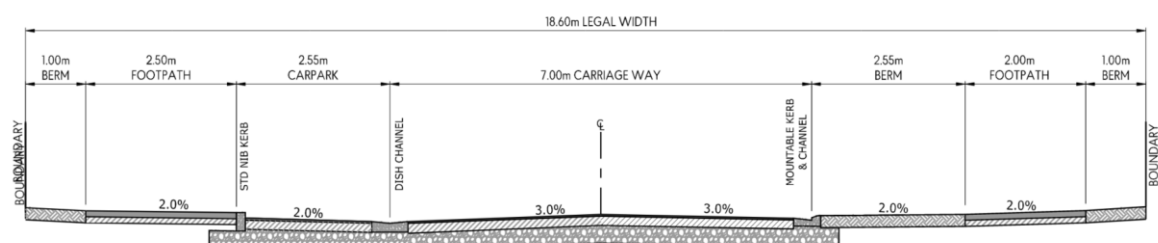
Typical Cross-Section (E) Collector - 18.6m with Berm & Carpark
